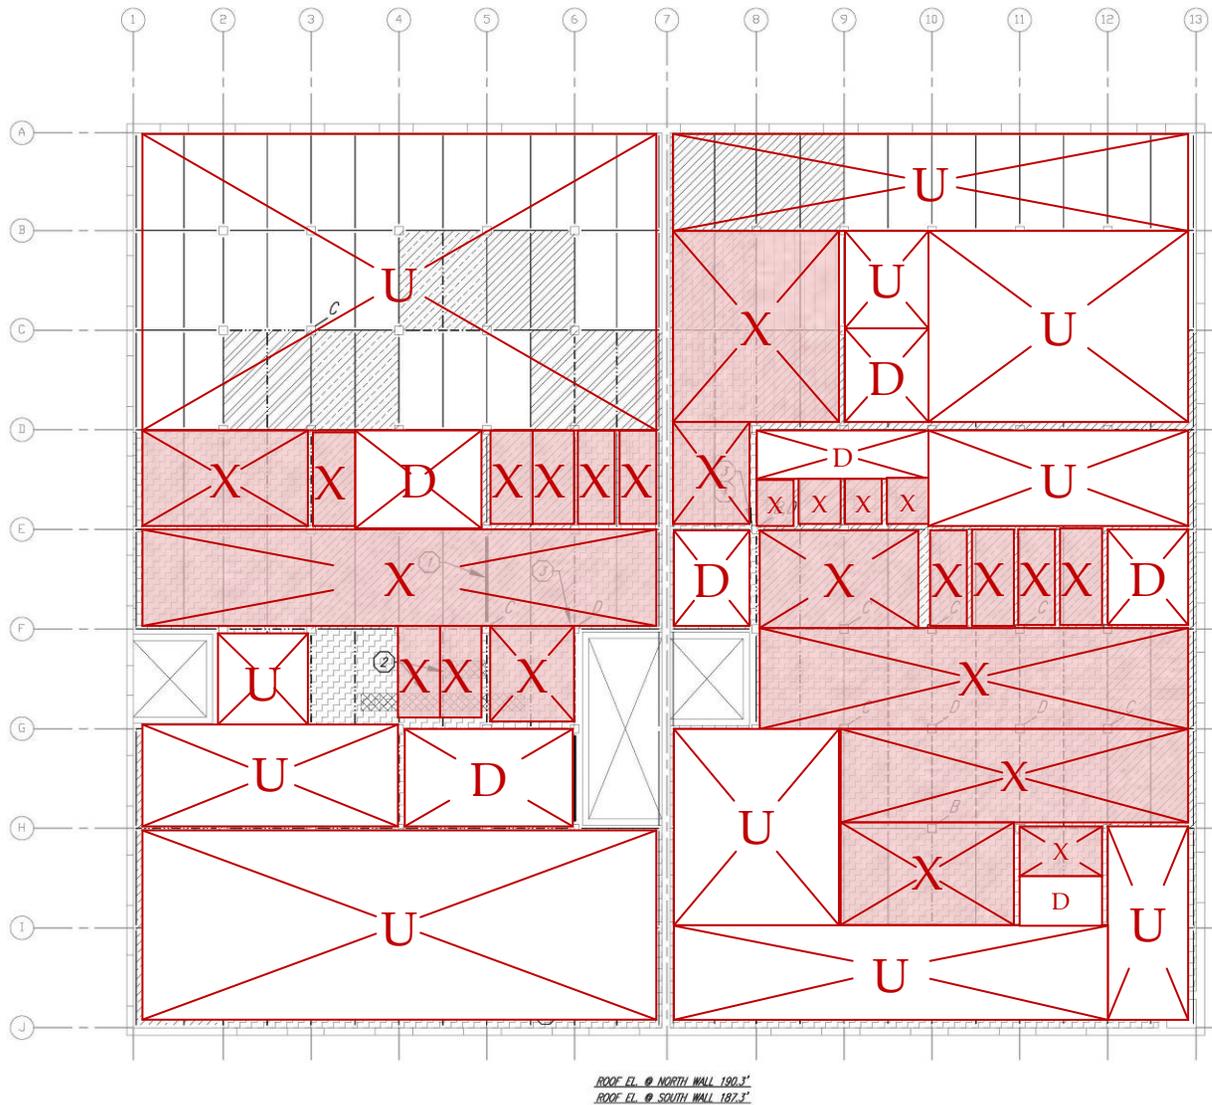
Seventh Floor Framing Plan - 2000 and 2011 (red)
